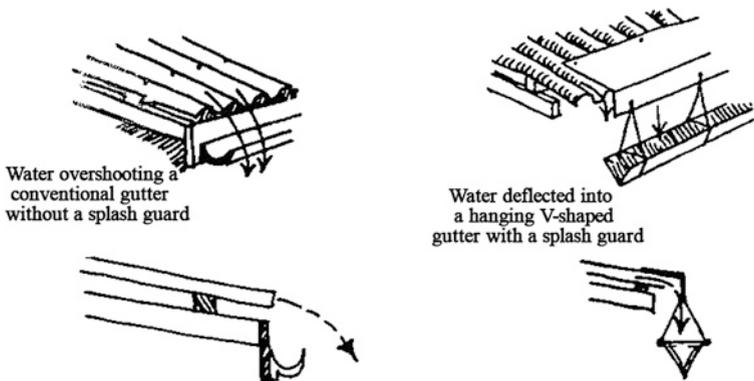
Splash Guards—useful additions to use in conjunction with V-shaped gutters on long roofs to avoid water loss from over-shooting (Courtesy and adapted from Skinner 1990)
